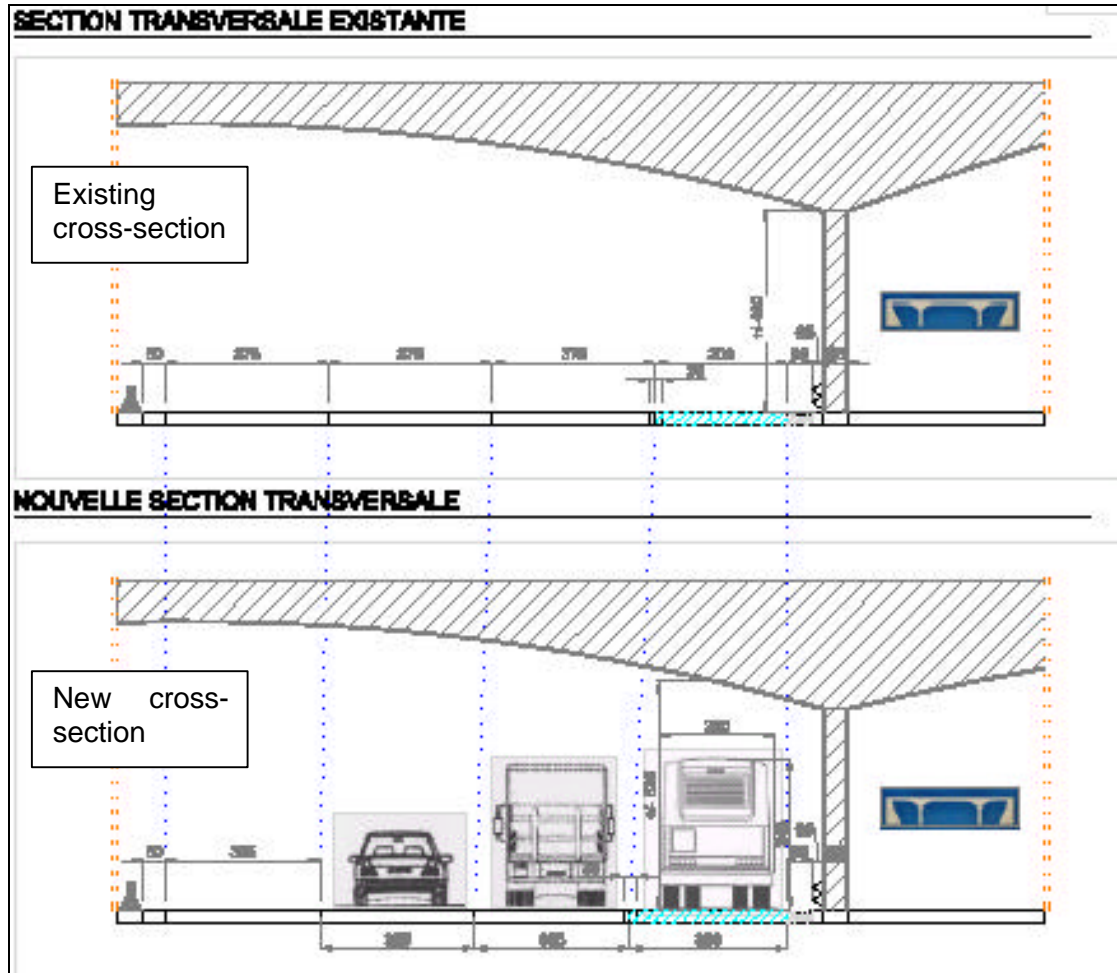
Passage under a bridge (existing cross-section and new cross-section)
